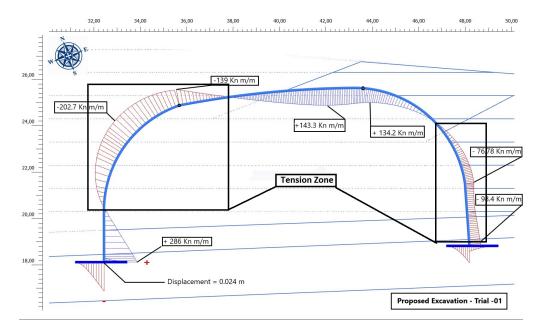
Tension zone - Proposed Excavation - Trial 01 - Analysis
